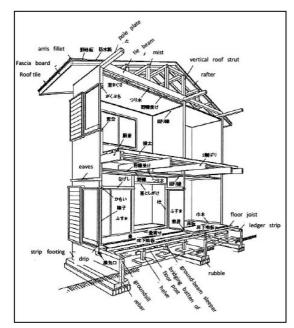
Cross Section of a Typical Japanese Home with Standardized Concrete Foundation and External Walls [5]
